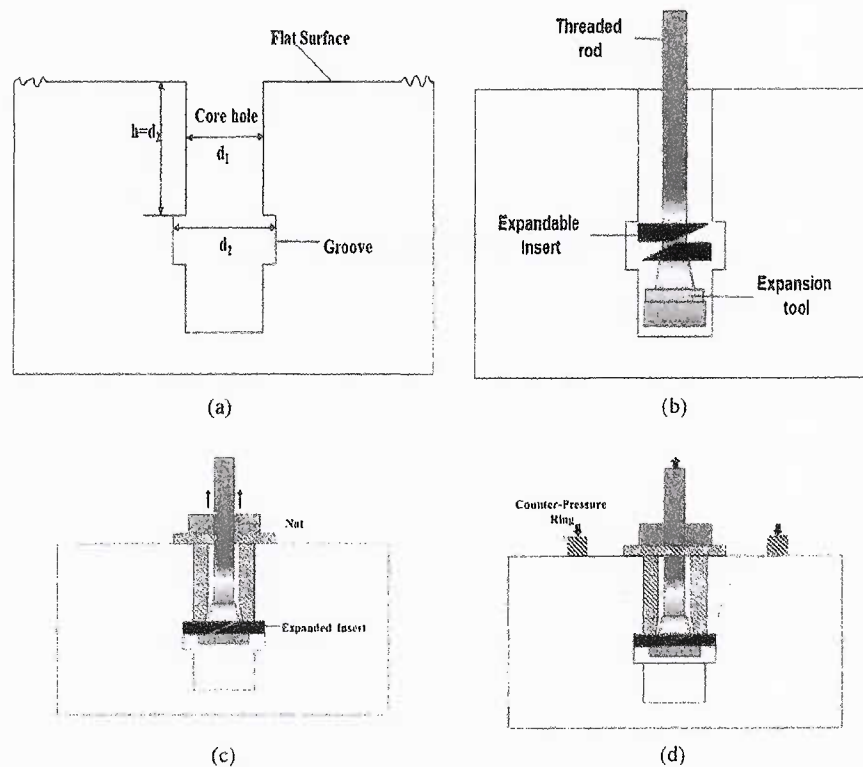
(a) Core hole with recess groove with smooth top surface. (b) Expandable insert with expansion tool. (c) Expanded insert. (d) Application of load during test.
